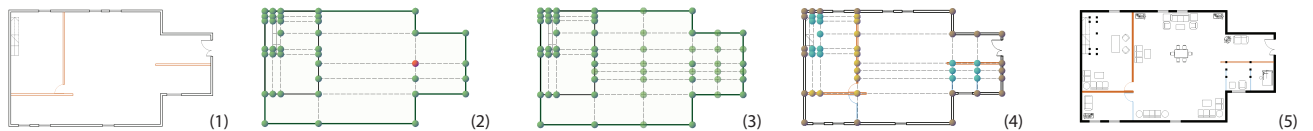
Results for multiple buildings. Column (1) always show the initial floorplan, column (2) shows the initial layout derived from the floorplan, in column (3) the initial grid is stabilized. Column (4) shows the final result after column and layout optimization, while in column (5) an architect extended this results by non-load bearing elements. Load bearing walls are always given in orange, while partitions are painted in blue.
